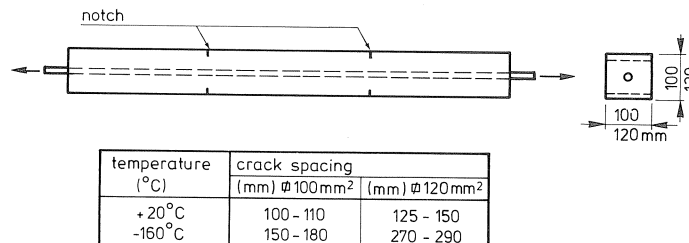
Long pull-out specimen for determining crack spacing [21].
